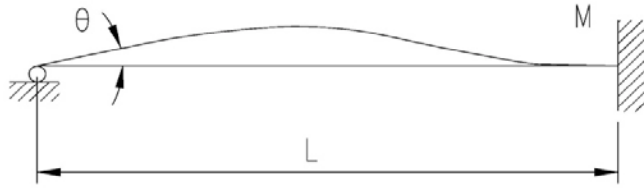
Schematic Link Slab Detail.
